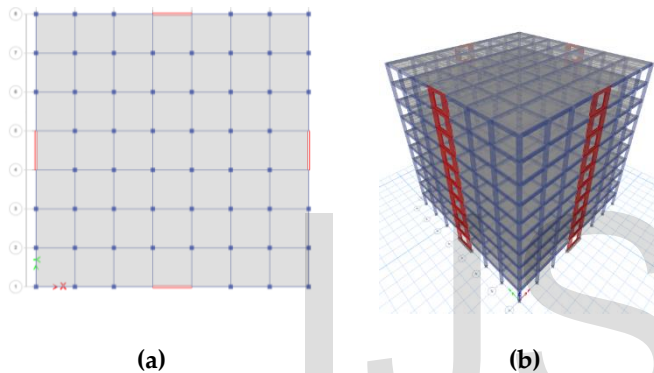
(a) Plan and (b) 3D model of CSW placed at center
